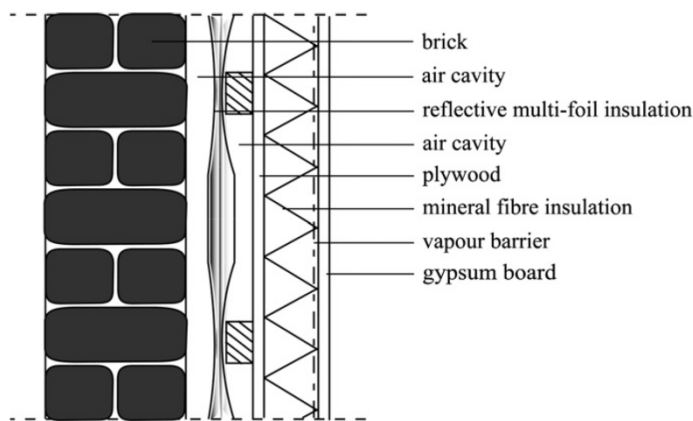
Reflective foil installed inside a wall cavity (Tenpierik and Hasselaar [72]).
